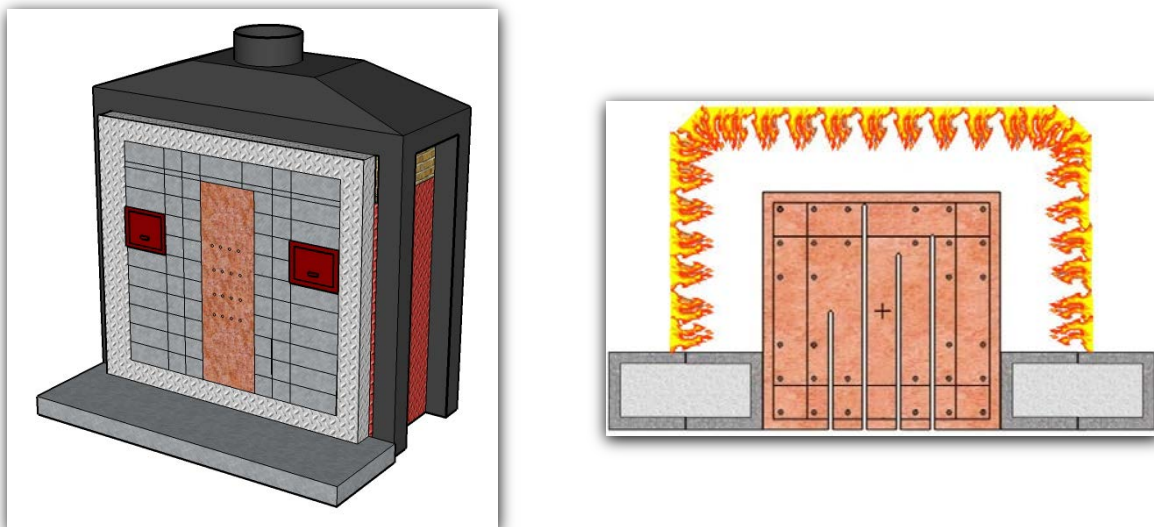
Testing furnace, prototype cross-section and thermocouples placing, and surfaces subjected to direct heating.
